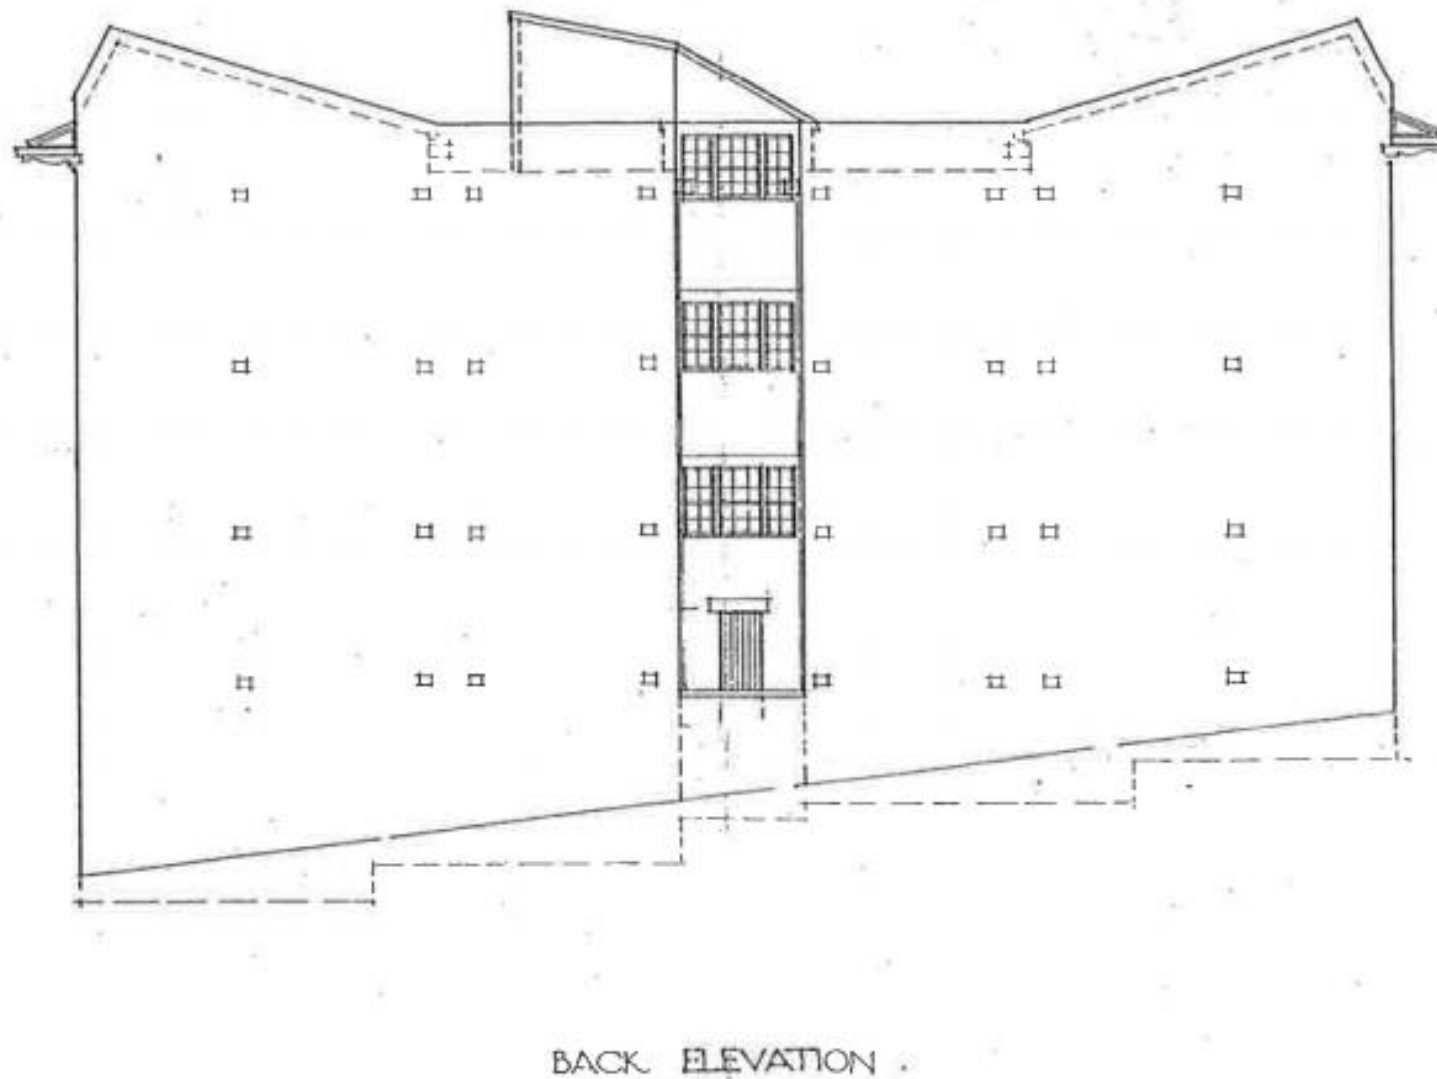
Proposed rear elevation of Wilkinson House, 1926.
